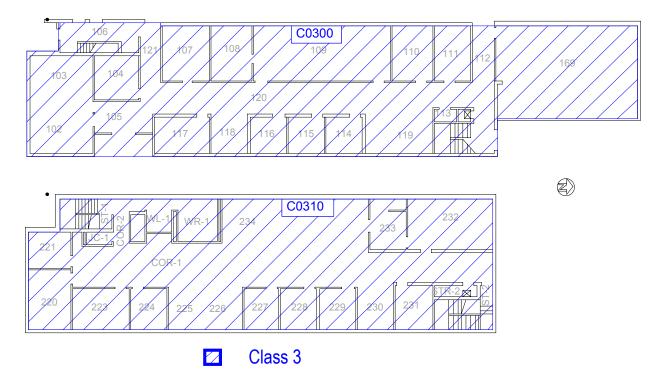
BMS B-124 New Section Class 3 Area Above False Ceilings
